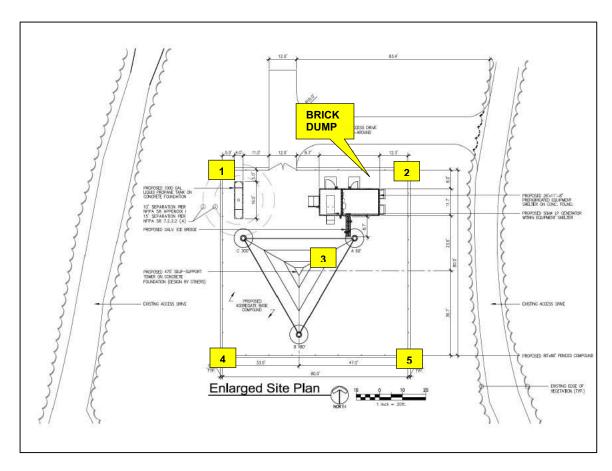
Plan view of proposed cell tower site and approximate shovel test locations in yellow (Trileaf/GLR 2018).
